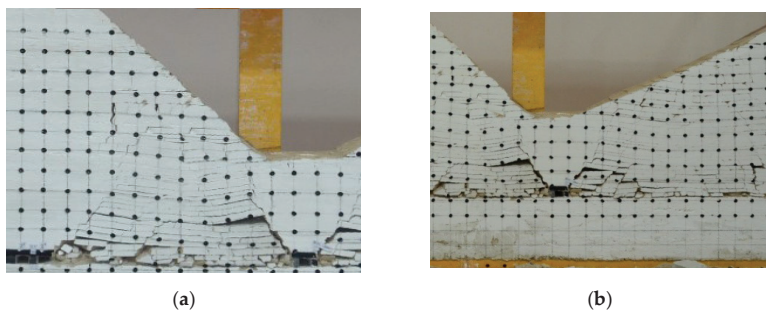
Overburden damage of the roadway. (a) Slope damage. (b) Roadway roof sinking damage.
